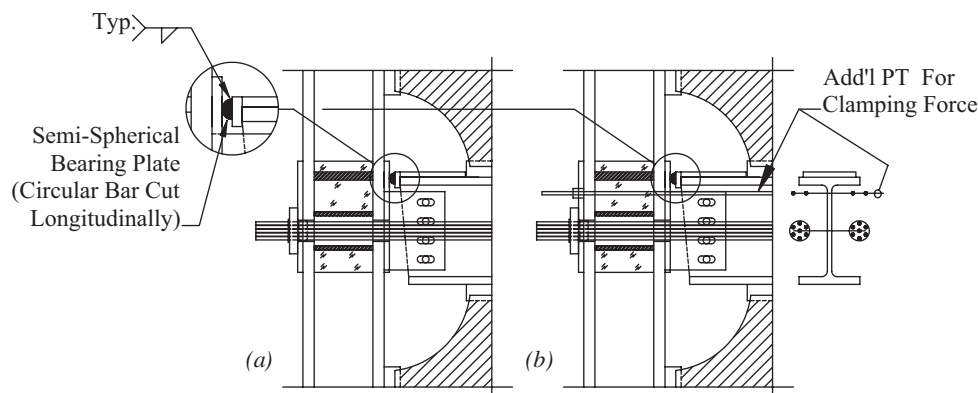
Modified NewZ-BREAKSS detail: (a) alternative 1; (b) alternative 2.
